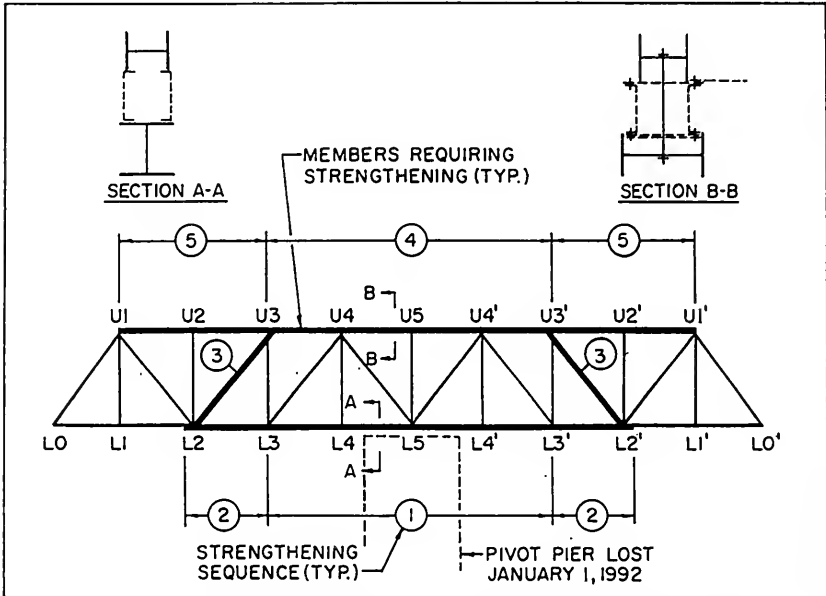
Swing Span Strengthened to 225 Ft. Long Simple Span
